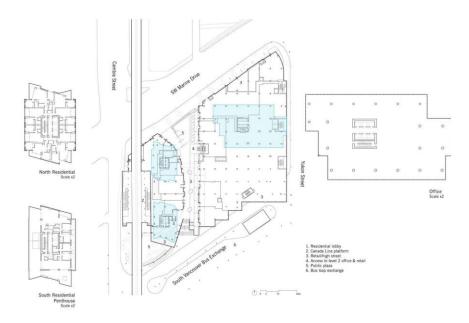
Figure C.I – Site plan (Perkins+Will) (Yeung, 2021).
